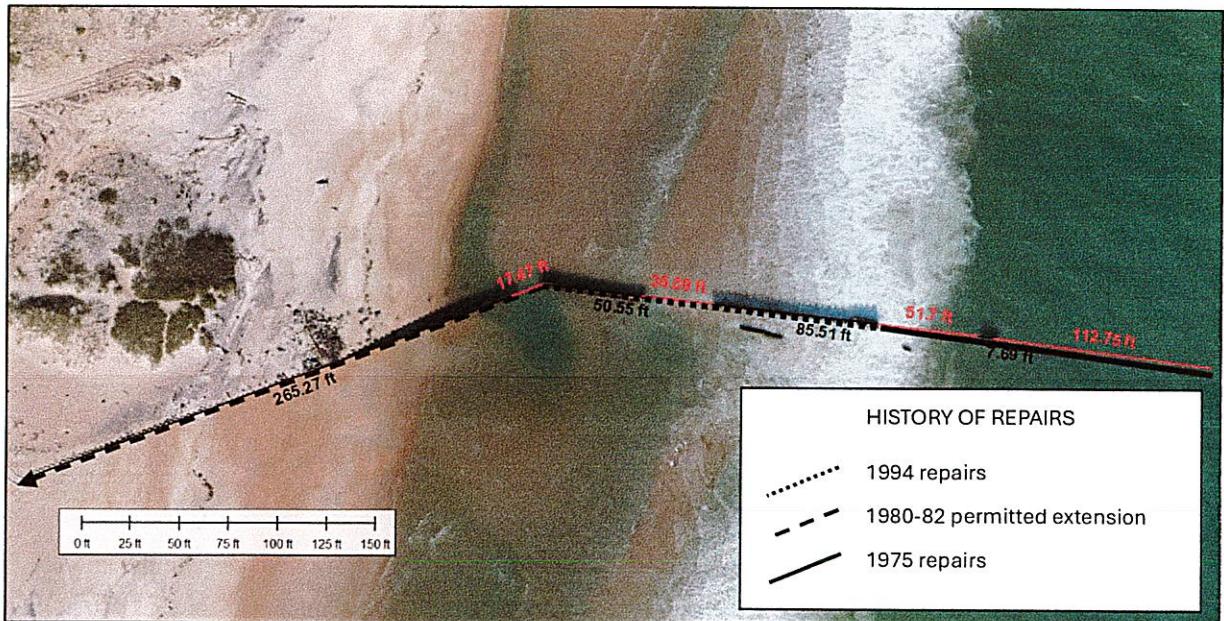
Figure E. Proposed repairs consist of placing sister sheet piles along 640 ft of the original footprint of the structure. Black segments indicate portions of sheet piles remaining in place, while red sections indicate portions of sheet pile lying below MSL (eg heavily damaged).
